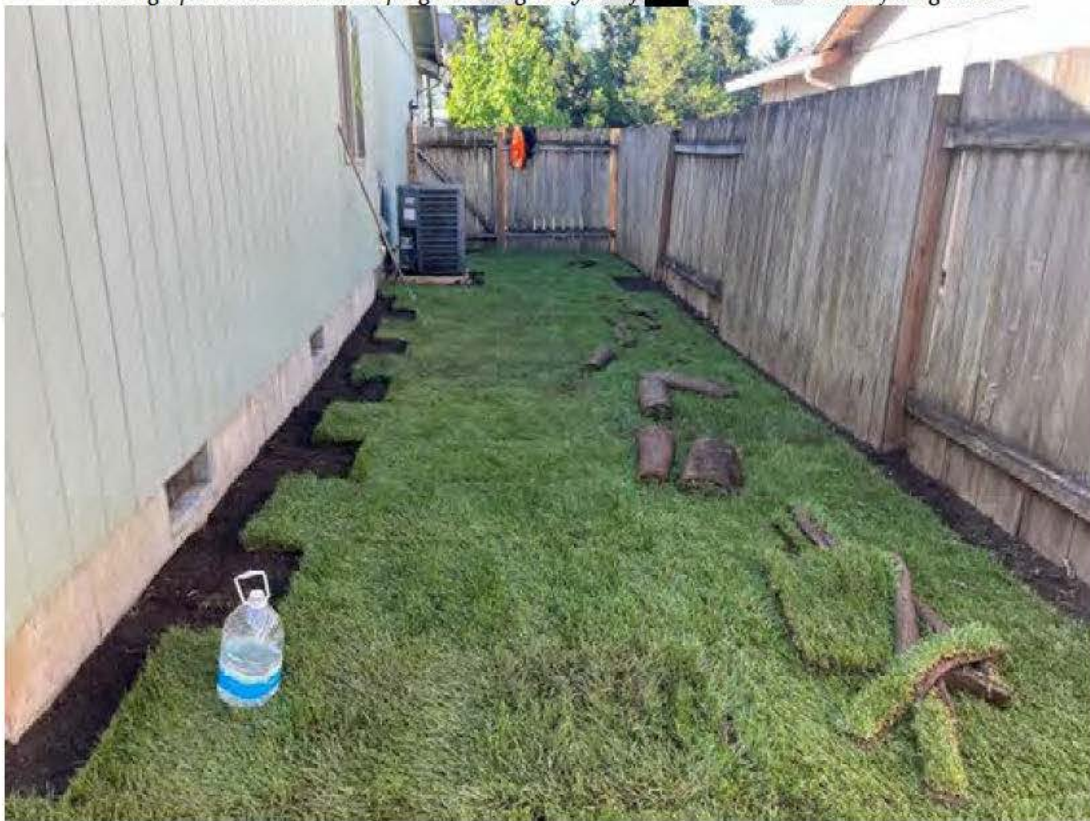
Resident selected plant locations for Rexius. Photo taken facing northwest.
